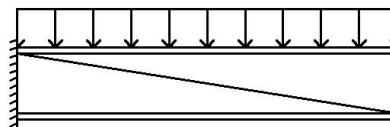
Pre-stressed symmetric I-shaped steel cantilever beam with steel cable under external loading
